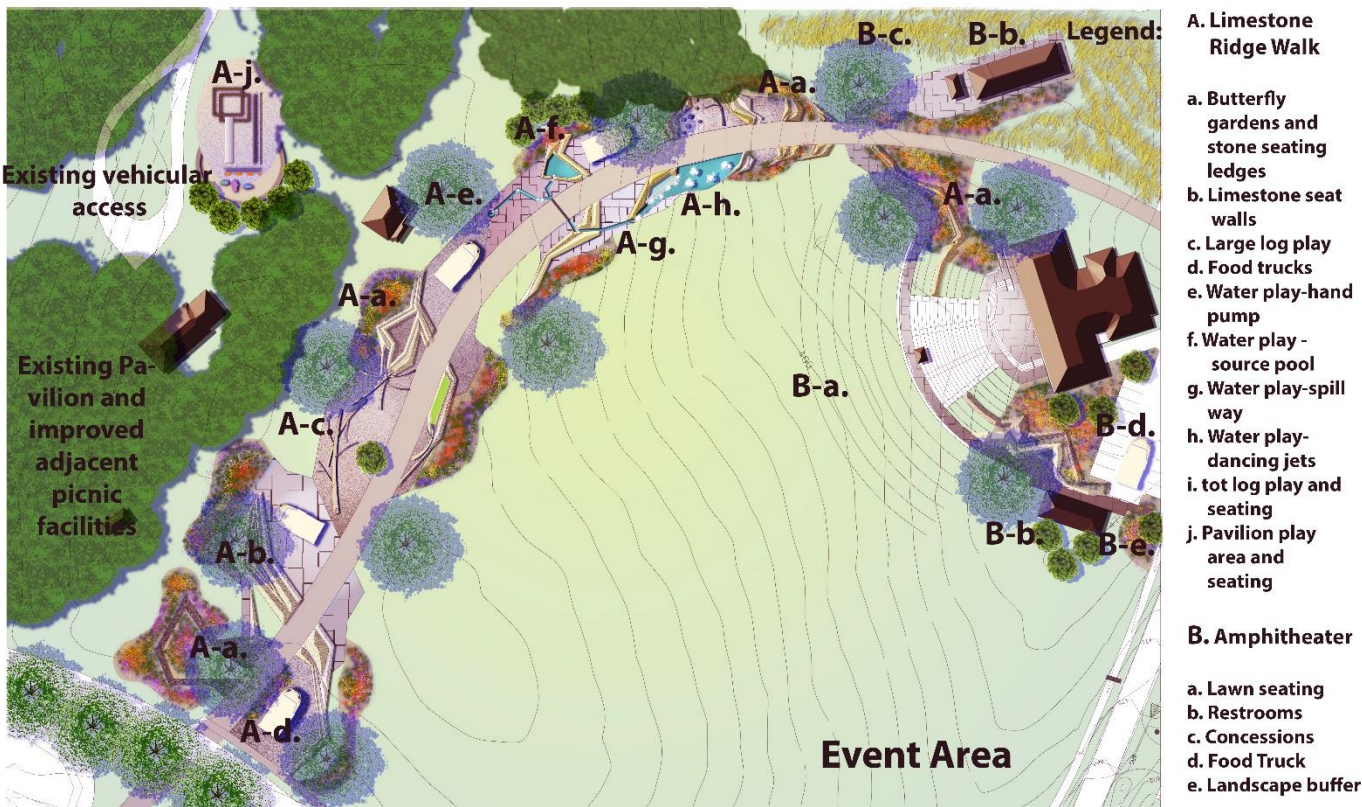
Limestone Log Play Area Detail Illustration (Master Plan Item #44)
